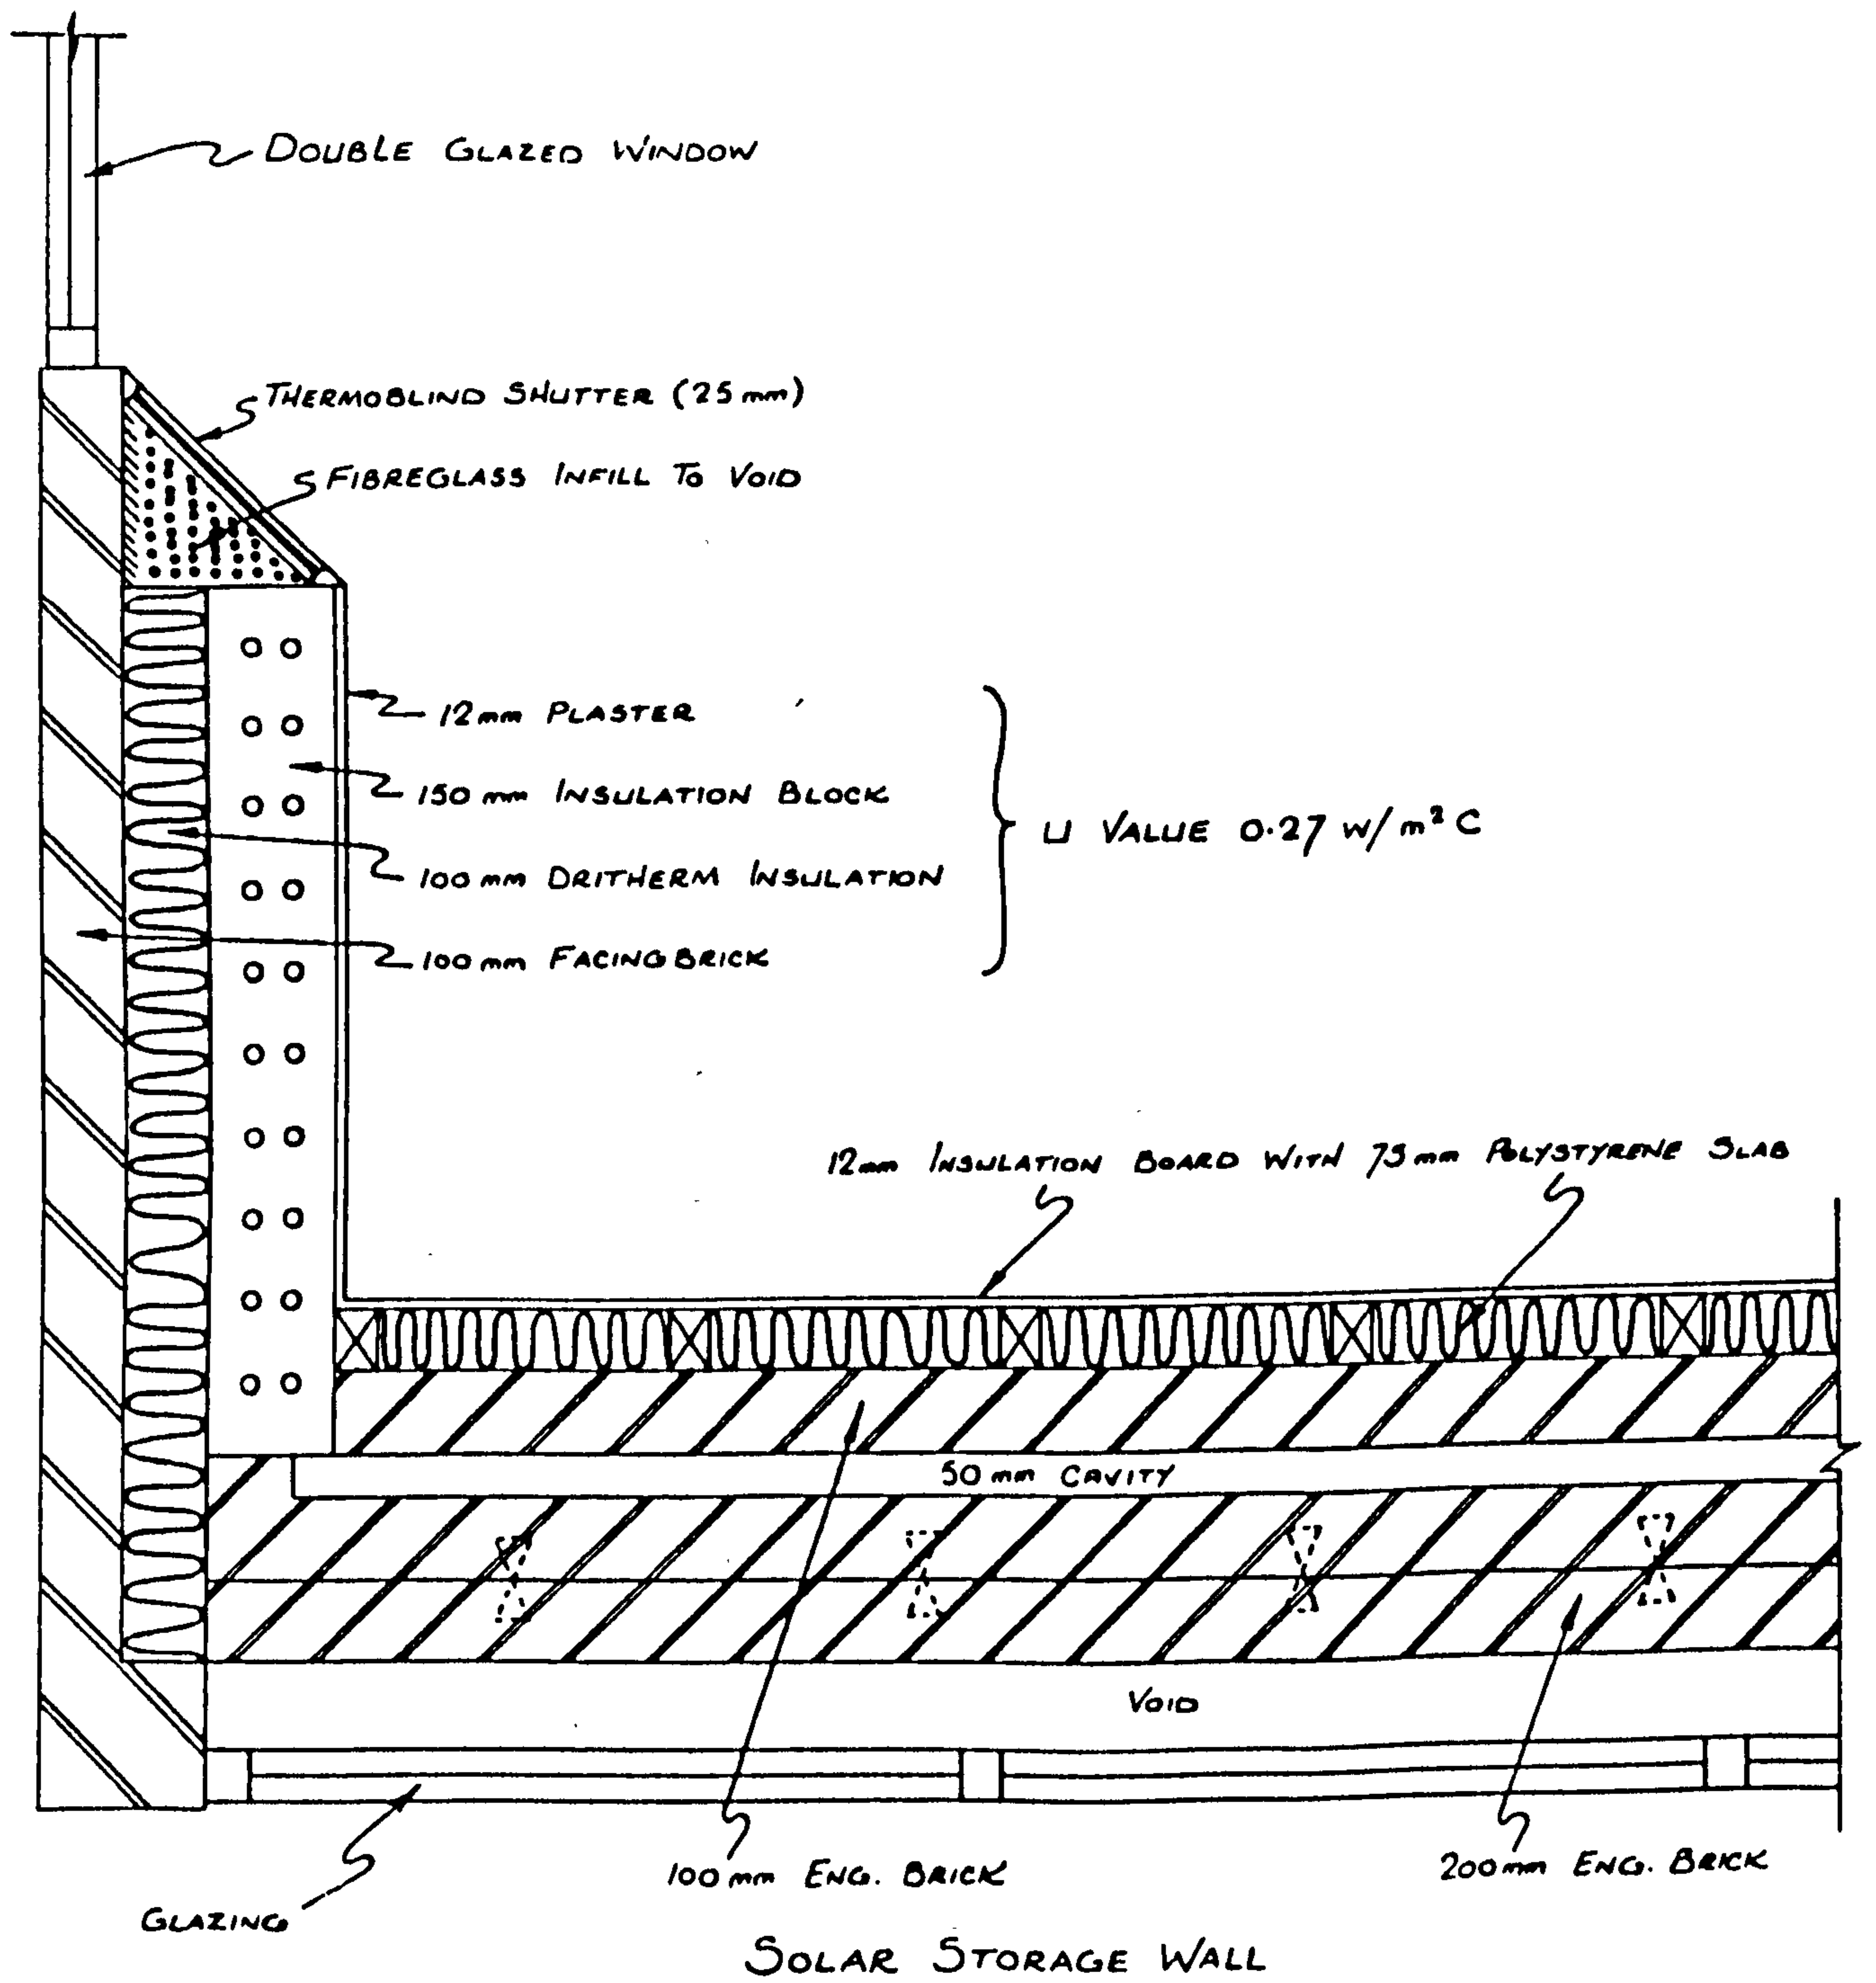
Plan of solar wall at Poulton Lancelyn primary school.
